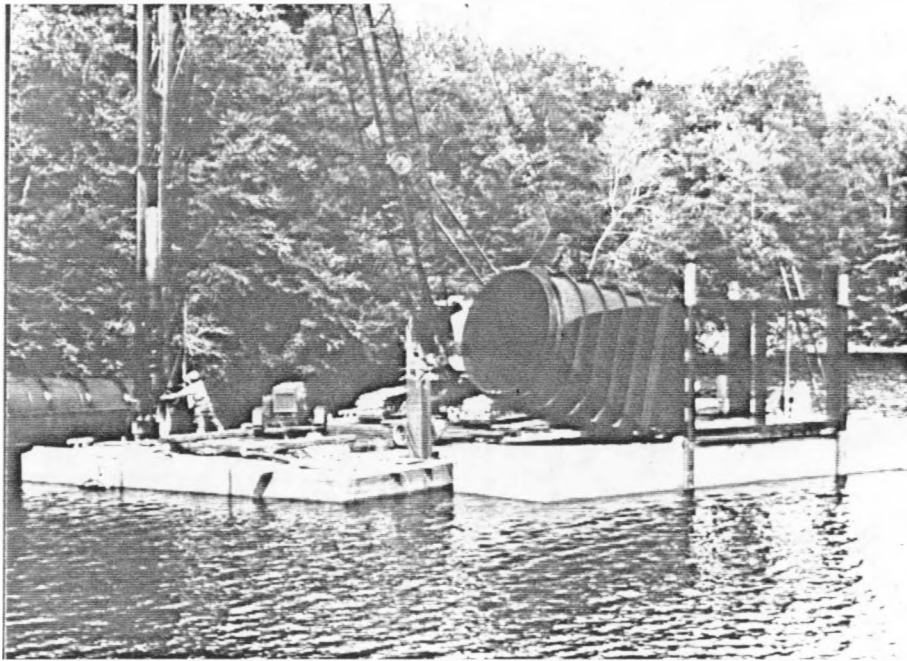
Preparing Intake Section for Installation at Lac Courte Oreilles
